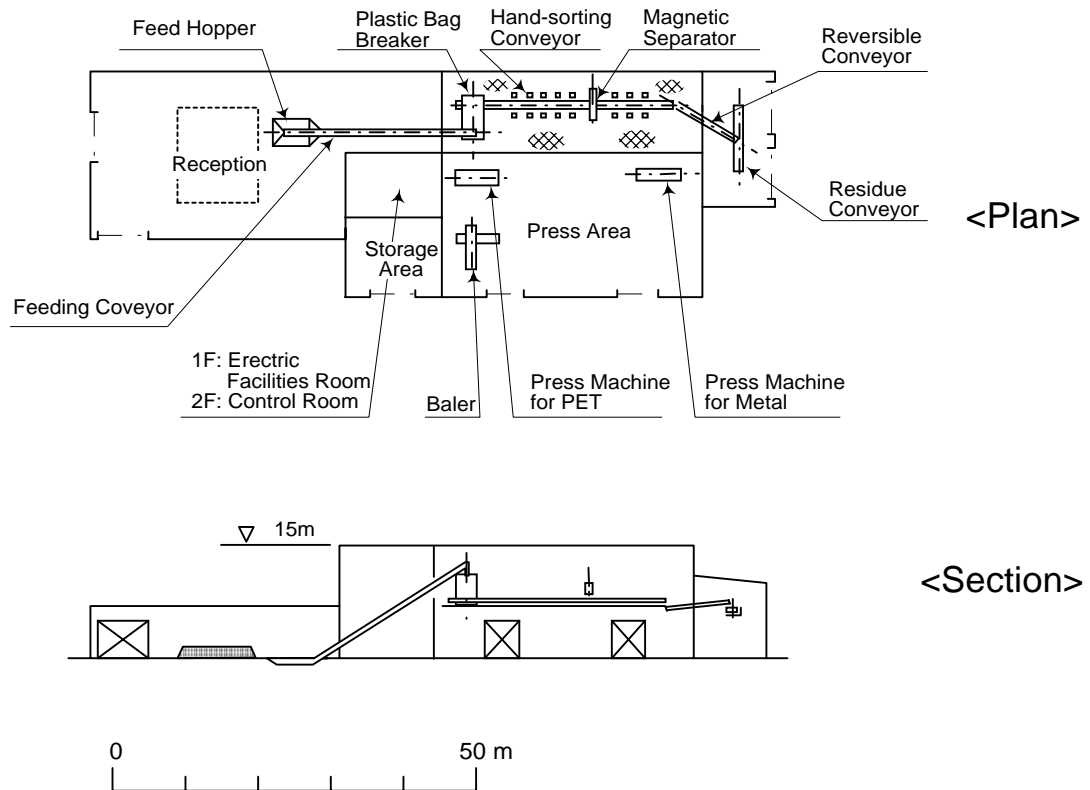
Layout of the Sorting Plant in Cimsa
